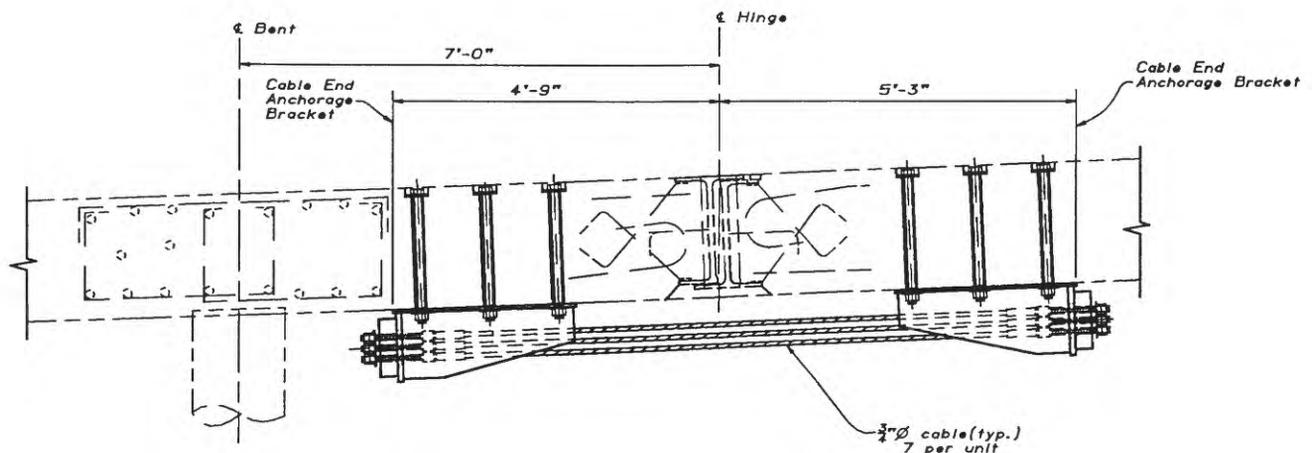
Elevation drawing of emergency hinge restrainer retrofit of Mococo Off-Ramp.
